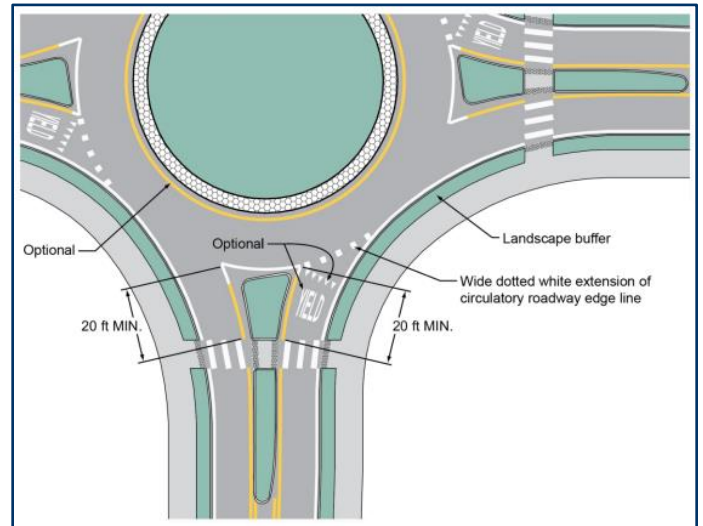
Roundabout Design Elements (Source: OMUTCD)
